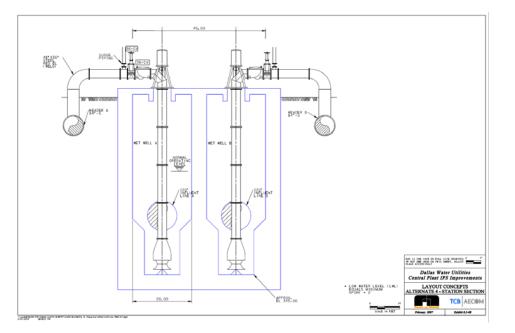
Layout for a Trench-Type Wet Well Vertical Turbine Solids Handling Pump Wet Pit Pump Station
